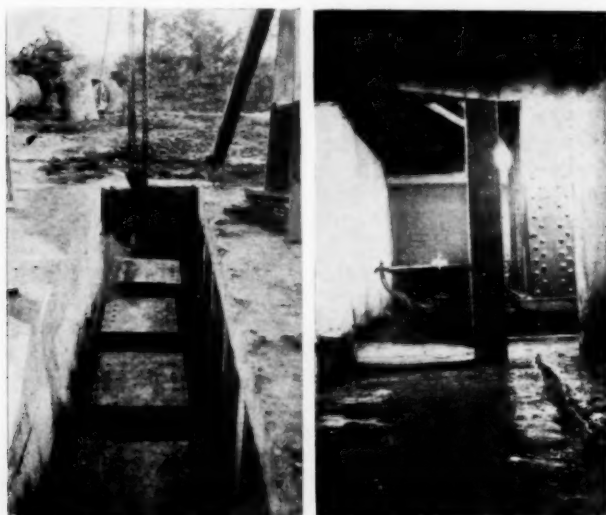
TOPS OF COLUMNS FOR SUPPORTING PIPE IN CONDITION OF 50 PER CENT PROJECTION AND INSIDE OF HOUSING CULVERT
